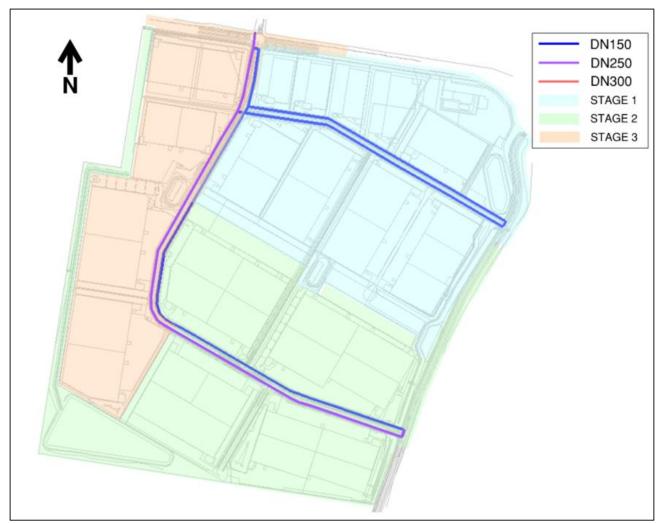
Concept Stage 1-3 Internal Water Network Layout
